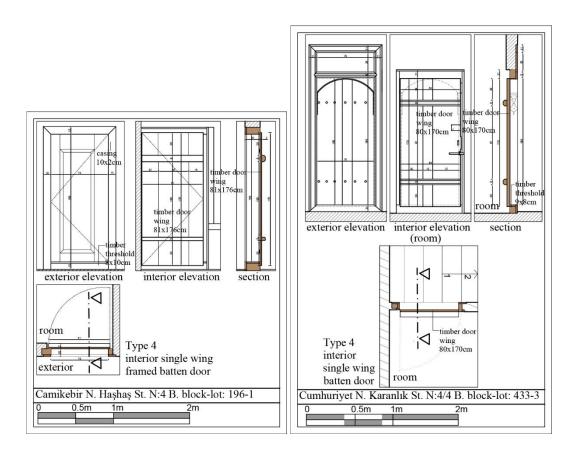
Drawing of interior single wing framed batten door located on timber framed wall (left); Drawing of interior single wing batten door with arched door frame located on timber framed wall (right) Type 4 (left, Camikebir N. b. block-lot: 196-1; right, Cumhuriyet N. b. block-lot: 433-2)
